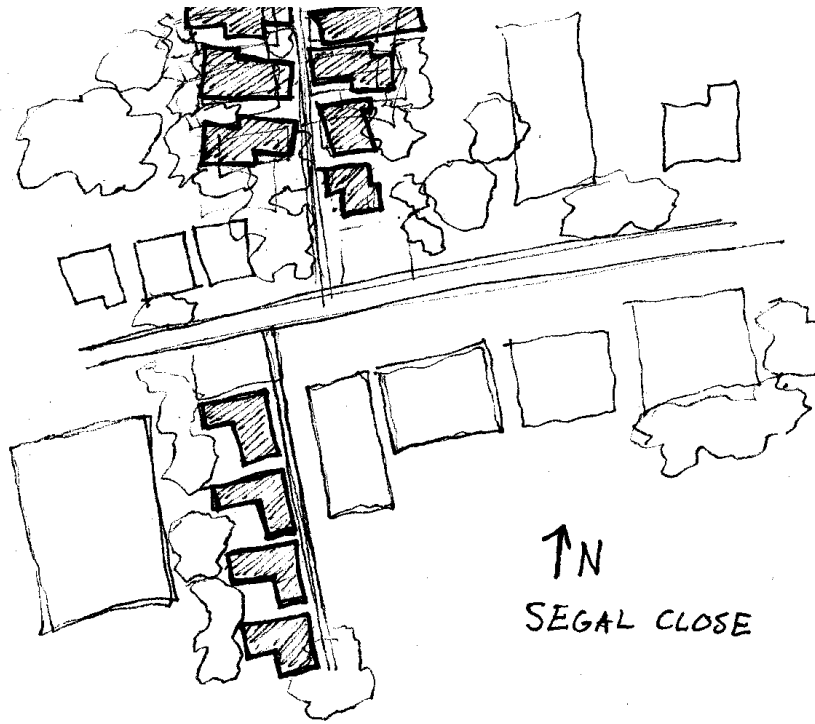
Sketch, Plan of Segal Close, 1979, London, UK. Source: Author
